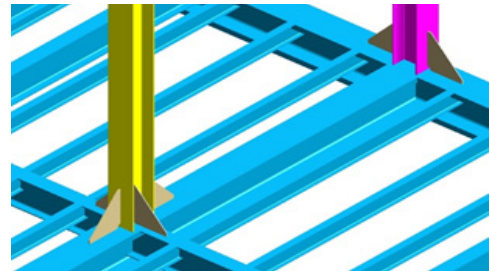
Examples of bracket installed on two or all faces of vertical beams
